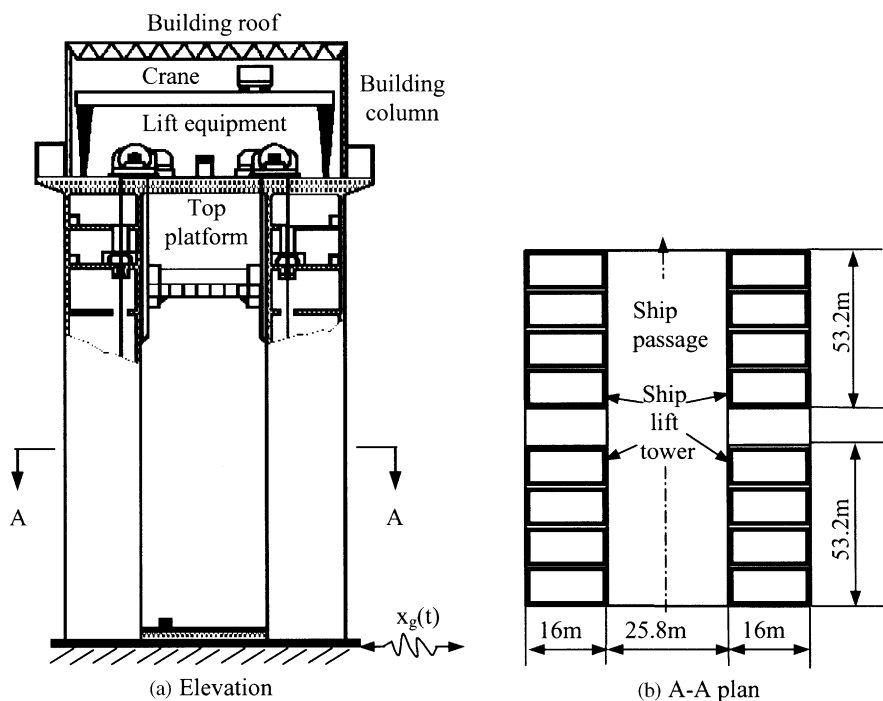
Elevation and plan views of ship lift structure: (a) elevation; (b) A–A plan.
